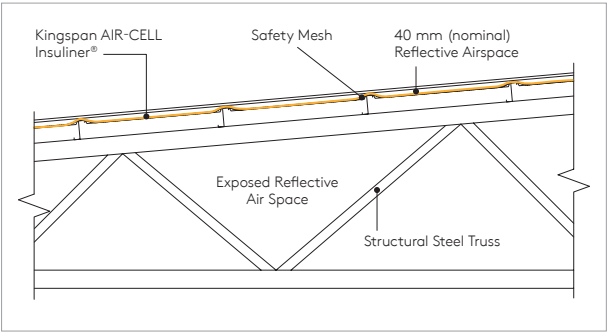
Side elevation of Kingspan AIR-CELL Insuliner® in a warehouse metal deck roof.
